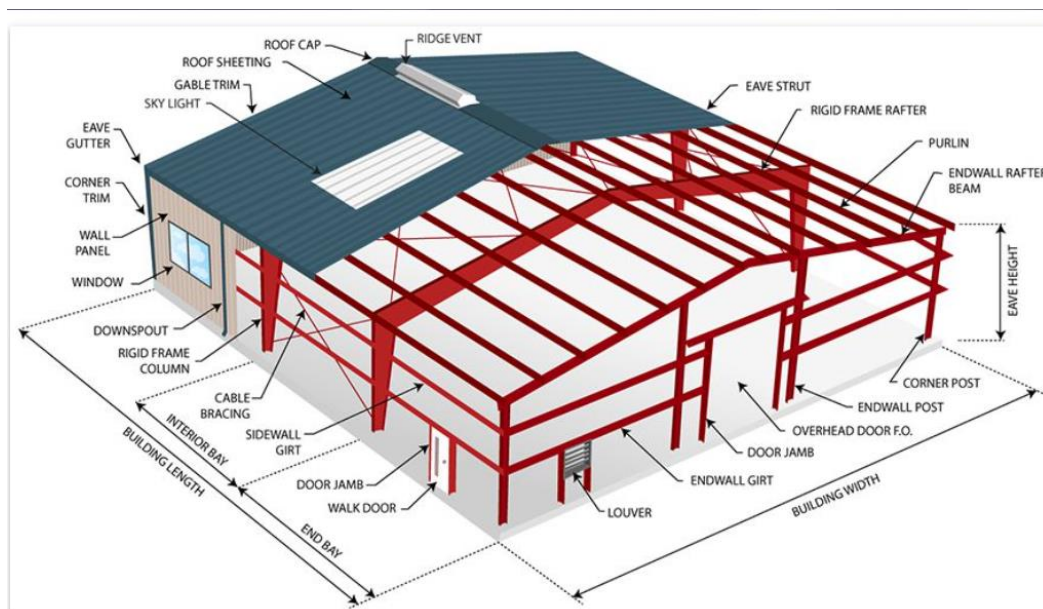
Parts of a steel building (<https://essteelbuildings.com/parts-steel->)
